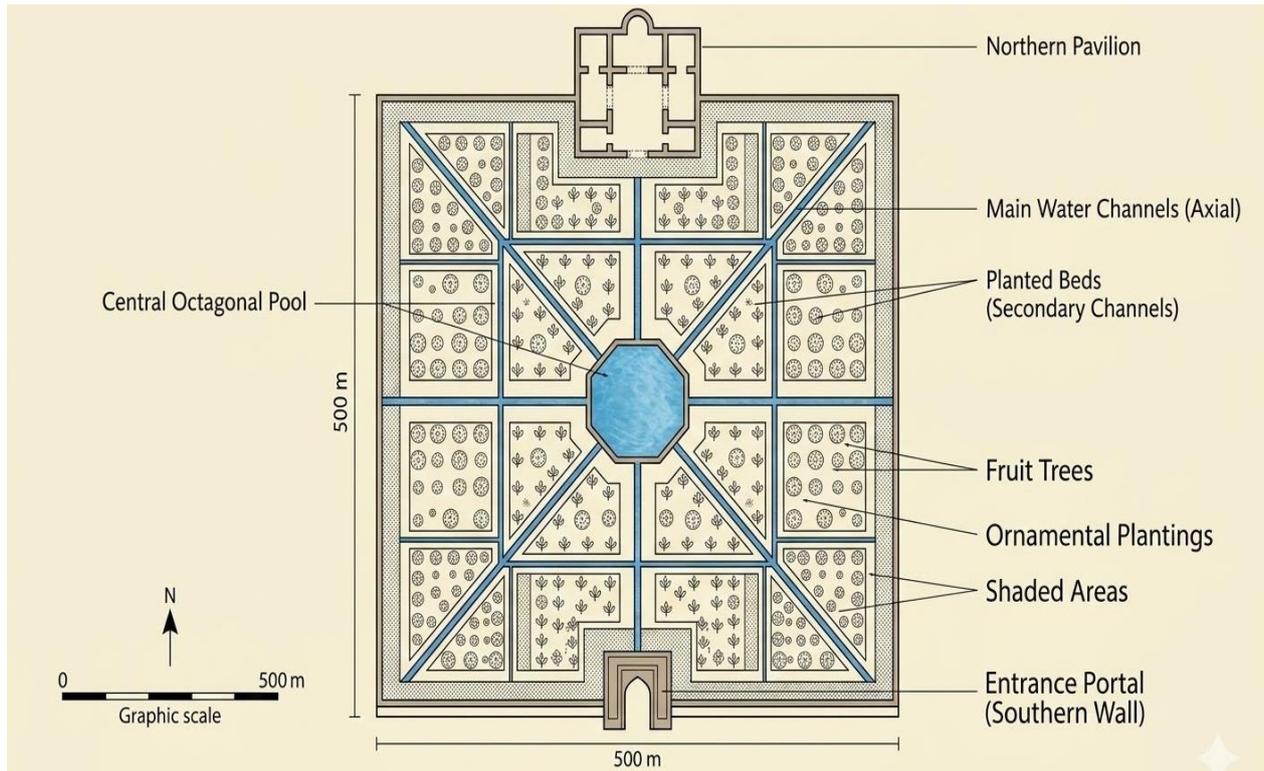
Reconstructed Plan of the Dilgusha Garden, Samarkand (c. 1400)
